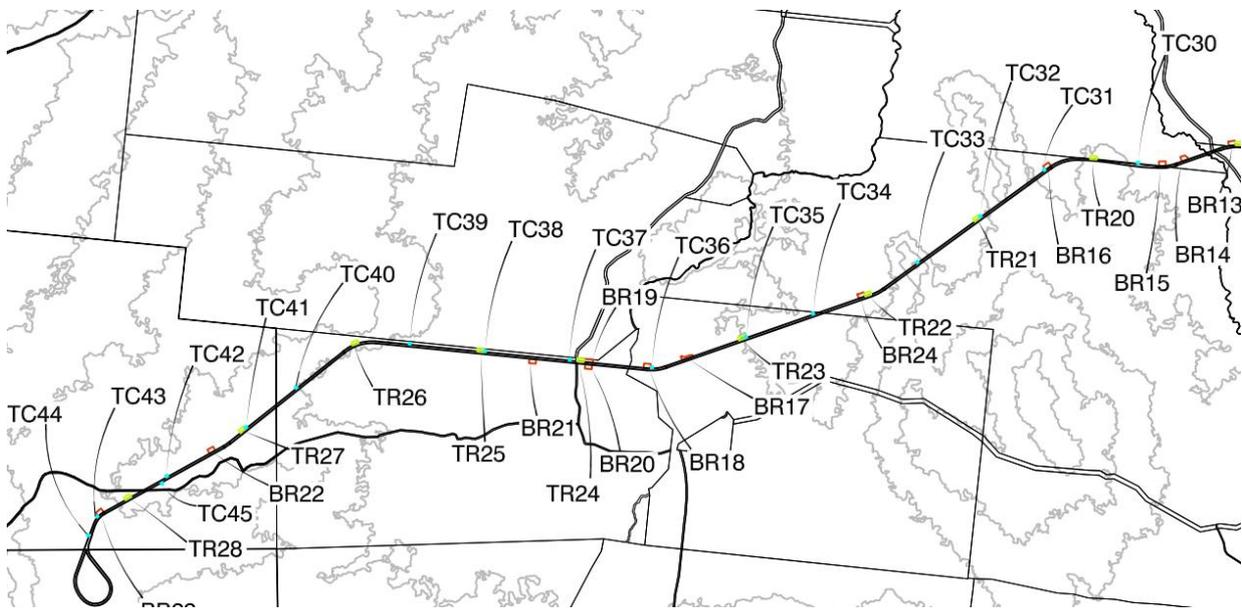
Plan showing proposed location of Laydown Areas (western half of SP1)
